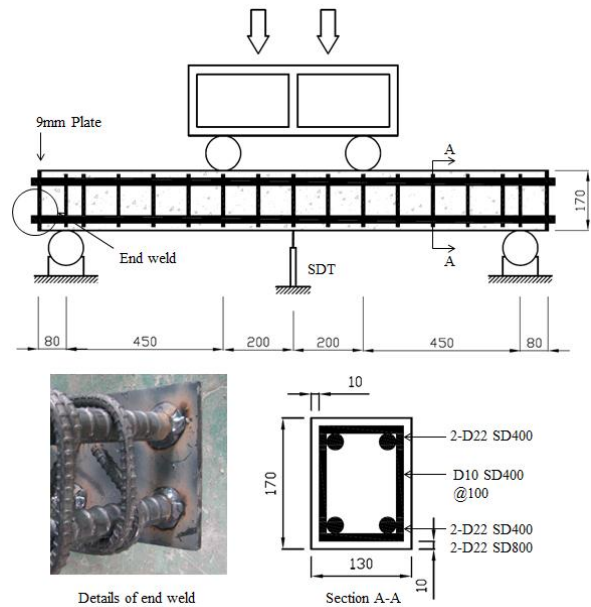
Section of reinforcement details of beams (dimensions in mm)
